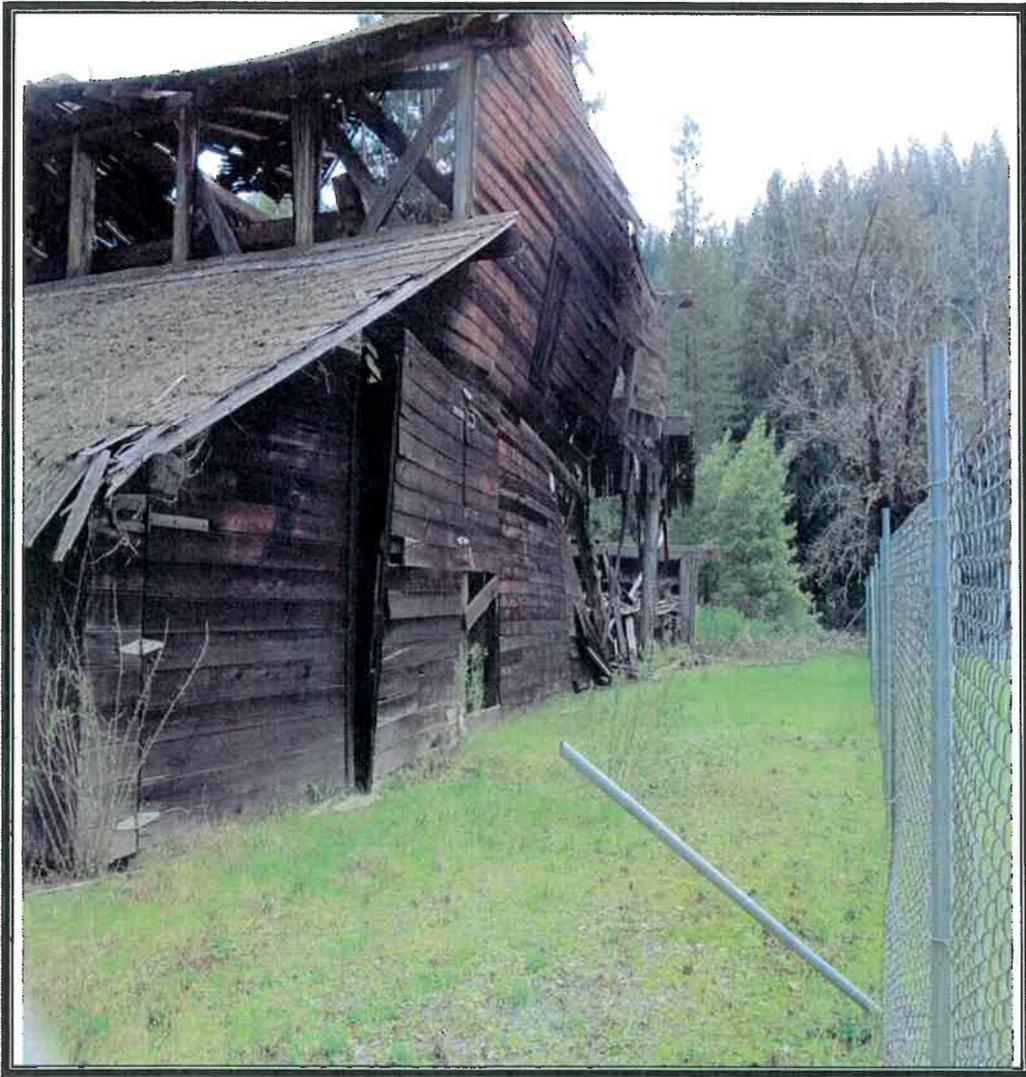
View of Structure Showing Outward Bow of Second Story Wall (2015).
